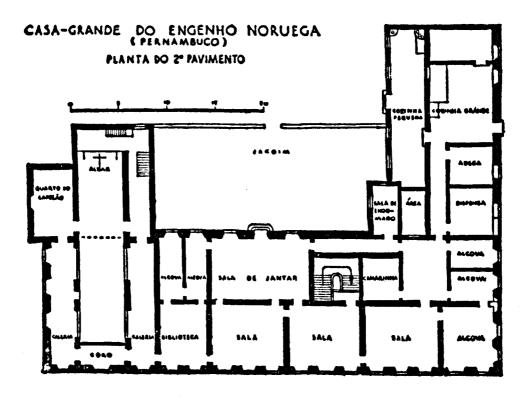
a sugar mill house plan - first floor (Freyre, op. cit., 435)
